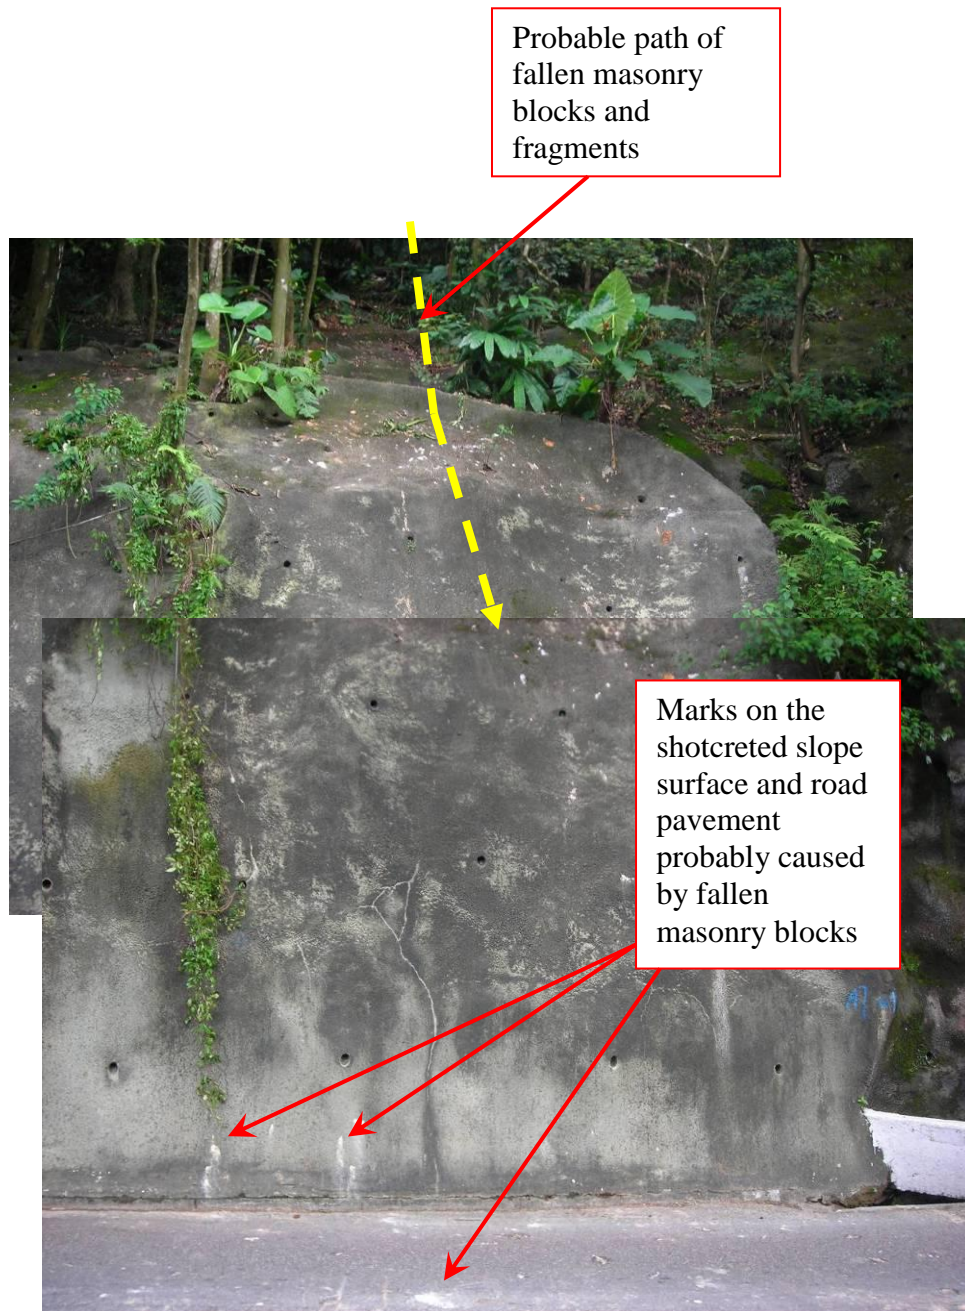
View of the Marks on the Slope Surface and Road Pavement Probably Caused by the Impact of Fallen Masonry Blocks and Fragments
